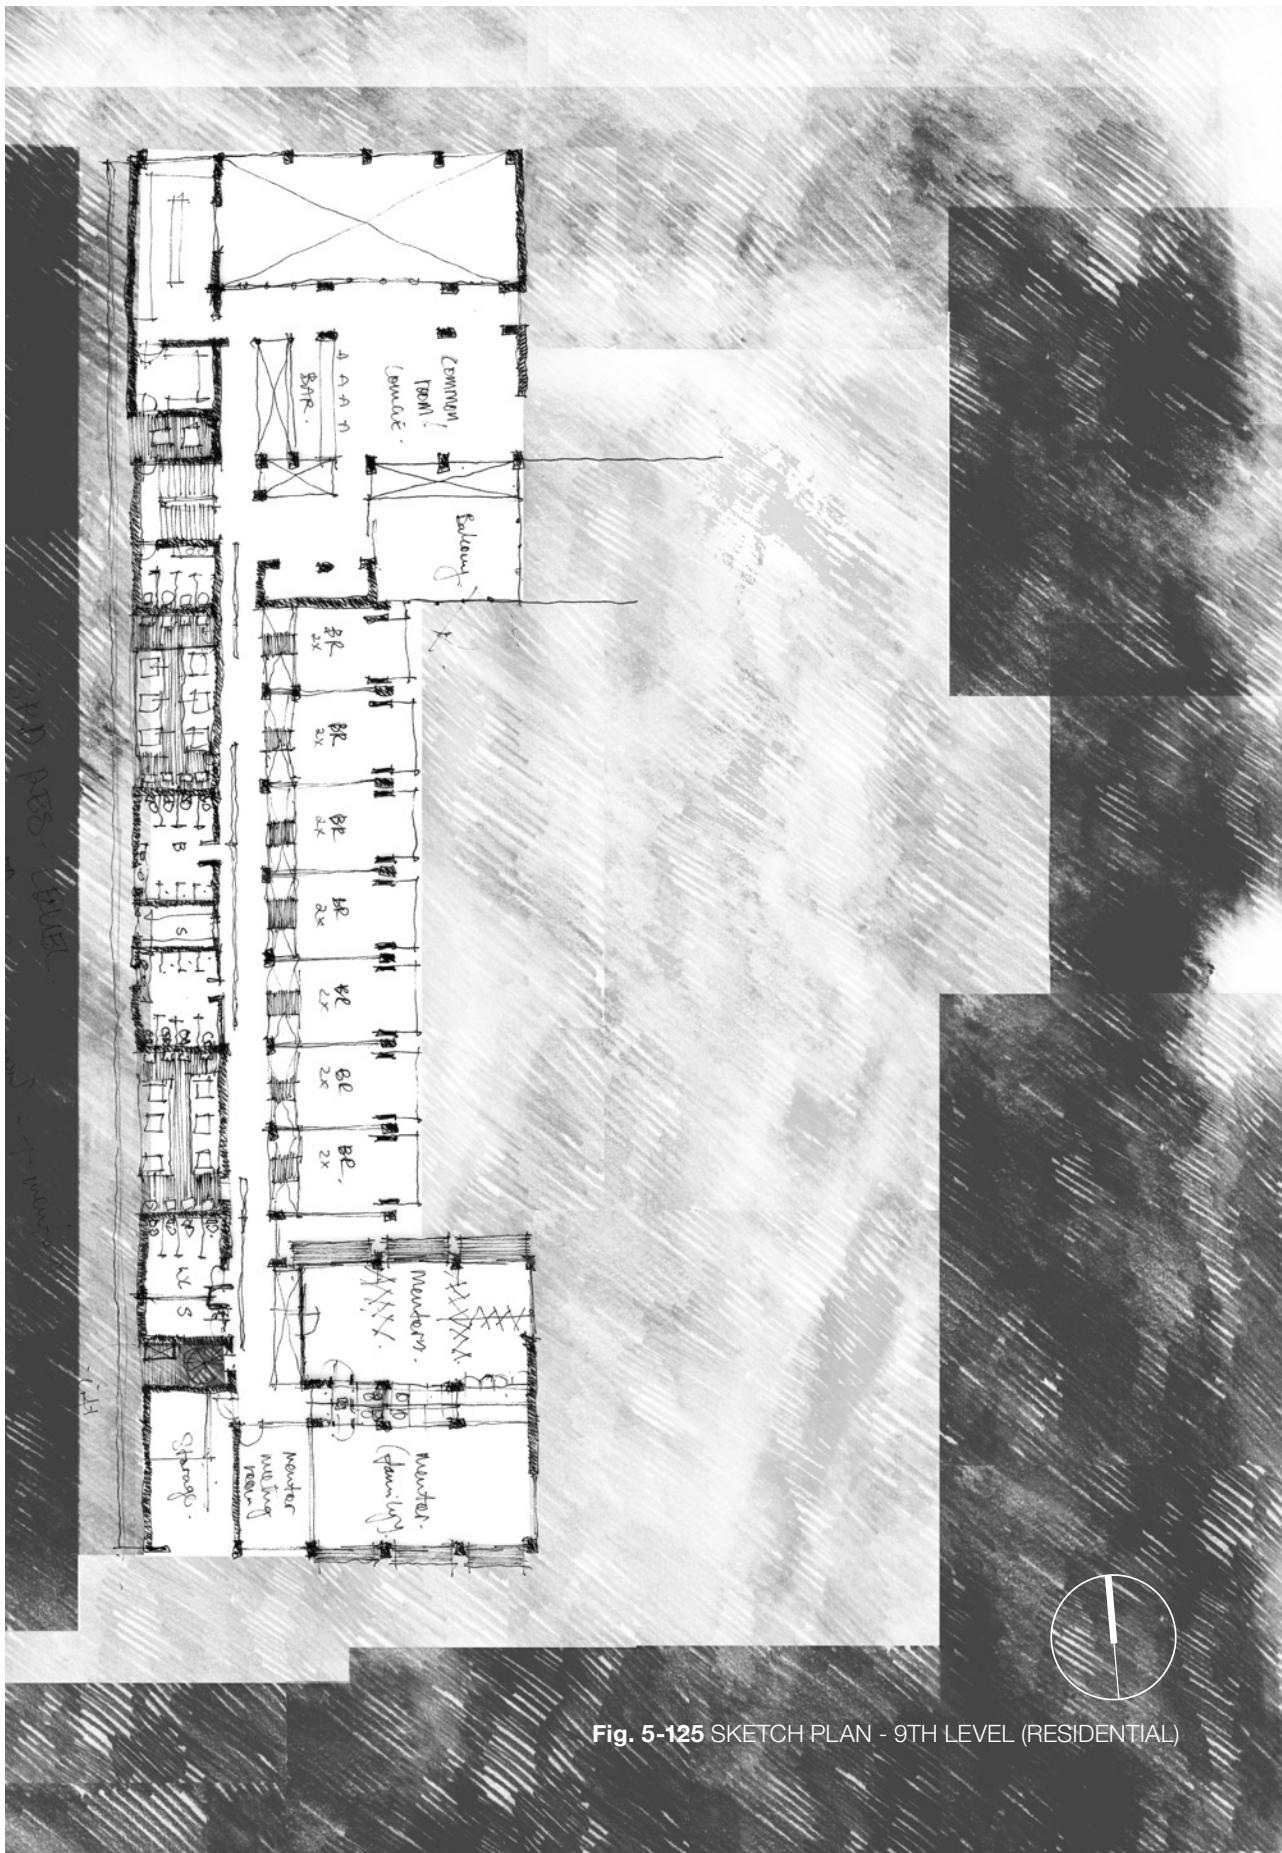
SKETCH PLAN - 9TH LEVEL (RESIDENTIAL)
